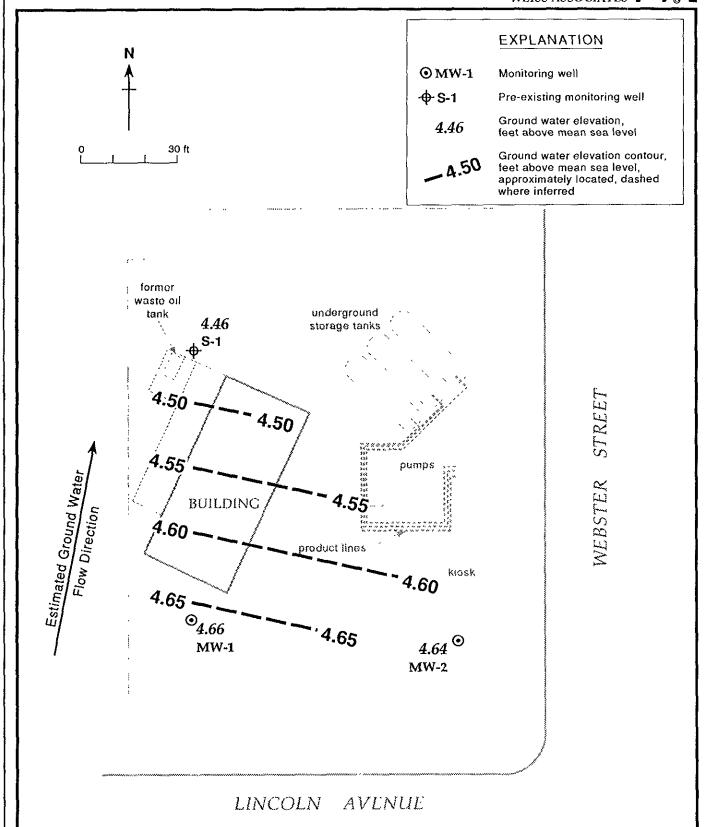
Monitoring Well Locations and Ground Water Elevation Contours - July 18, 1990 - Shell Service Station WIC #204-0072-0403, 1601 Webster Street, Alameda, California
